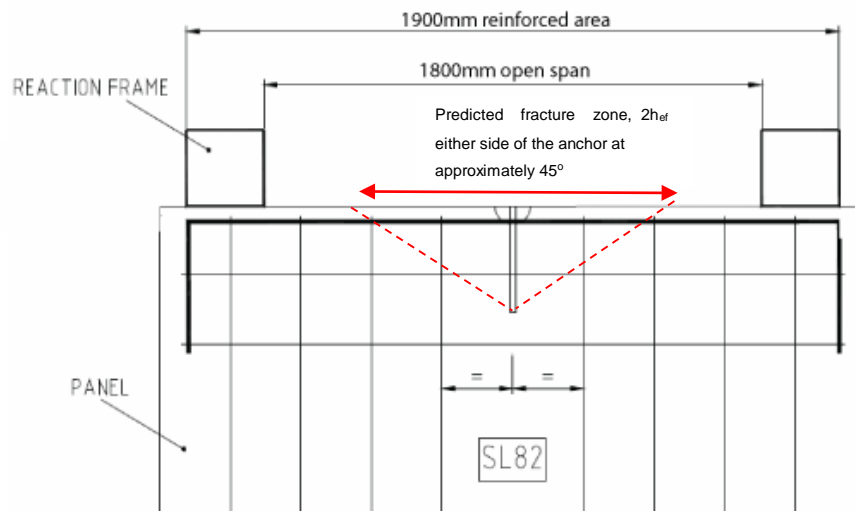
Panel plan indicating open span to the reaction frame (for Edgelift plate anchor tests)
